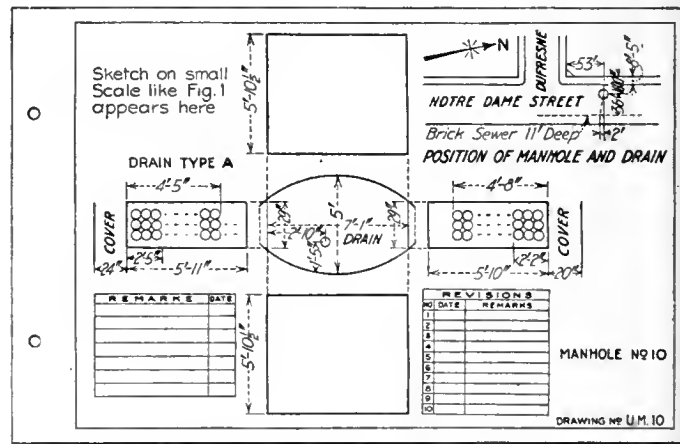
SAMPLE 6 1/2 X 8 1/2 IN. LEAF FROM FIELD NOTEBOOK, SHOWING MANHOLE LAYOUT AND DRAINAGE SCHEME
